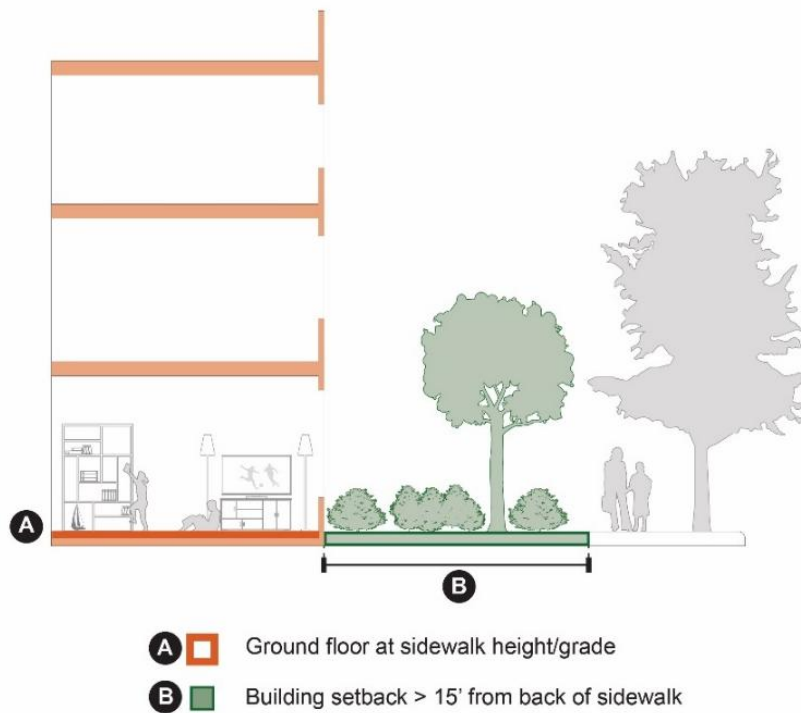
GROUND FLOOR UNITS, more than 15 foot setback
